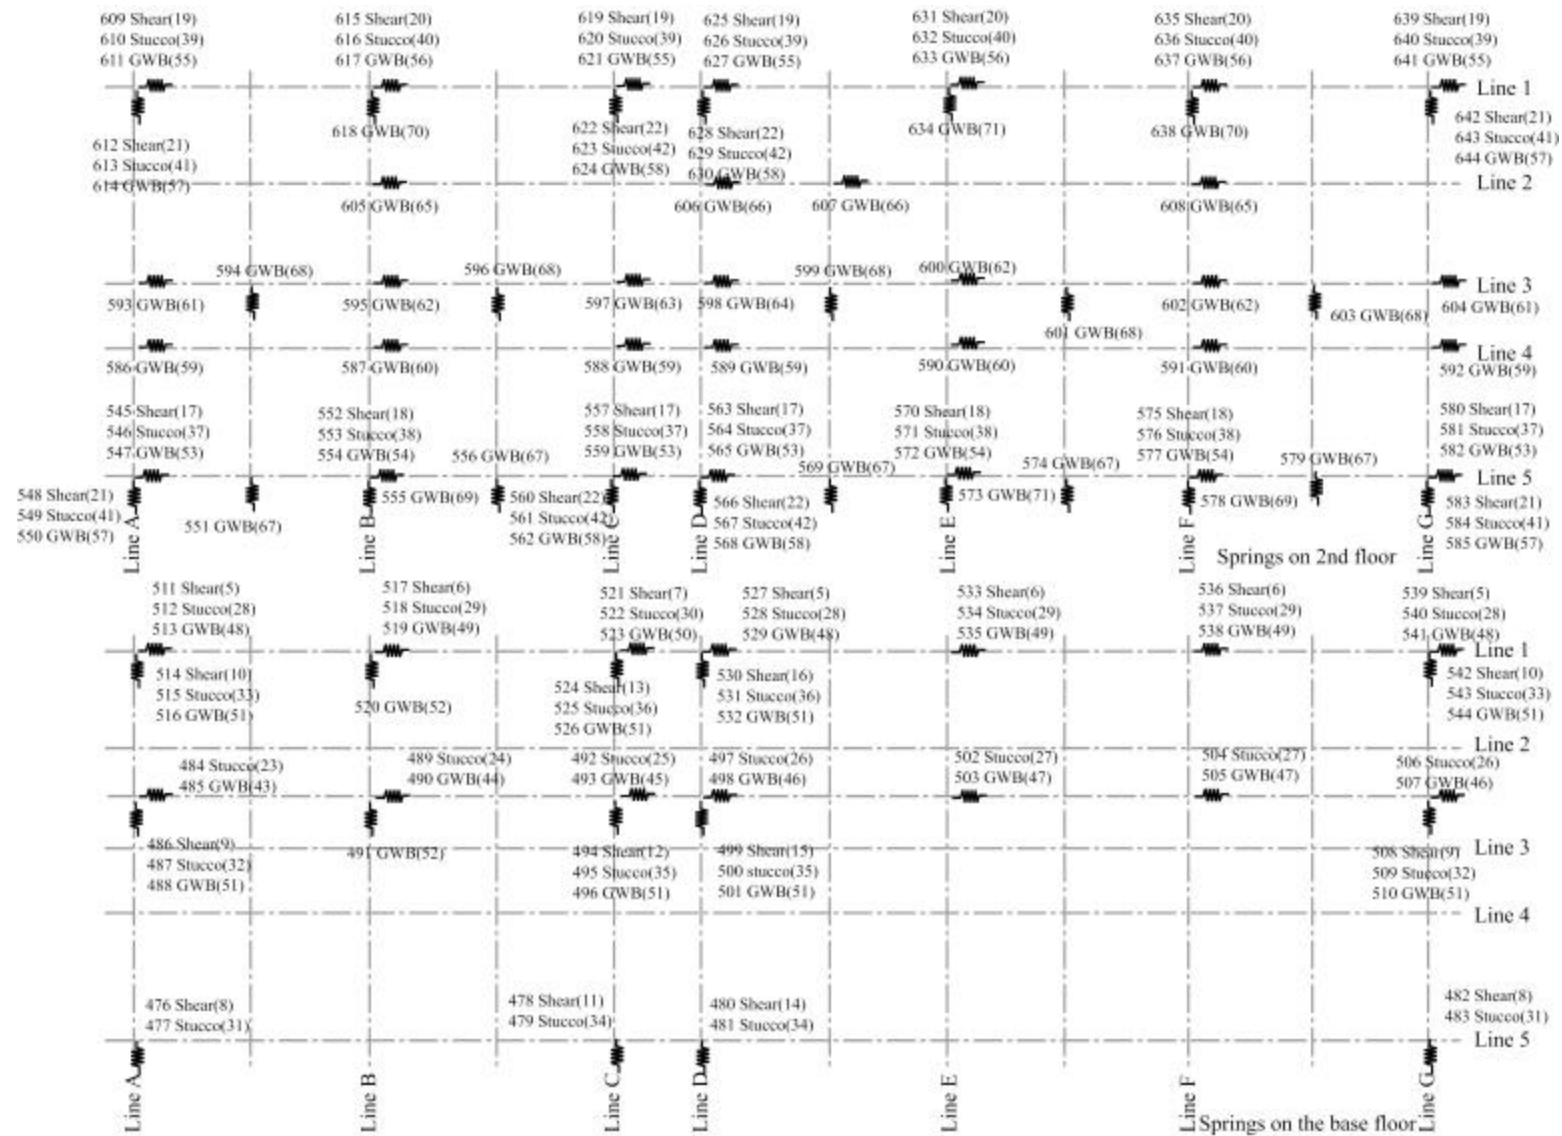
Locations, Orientation and Numbering of Shear Element for Interior and Exterior Vertical Walls on the First Floor and the Second Floor of the Apartment Index Building
